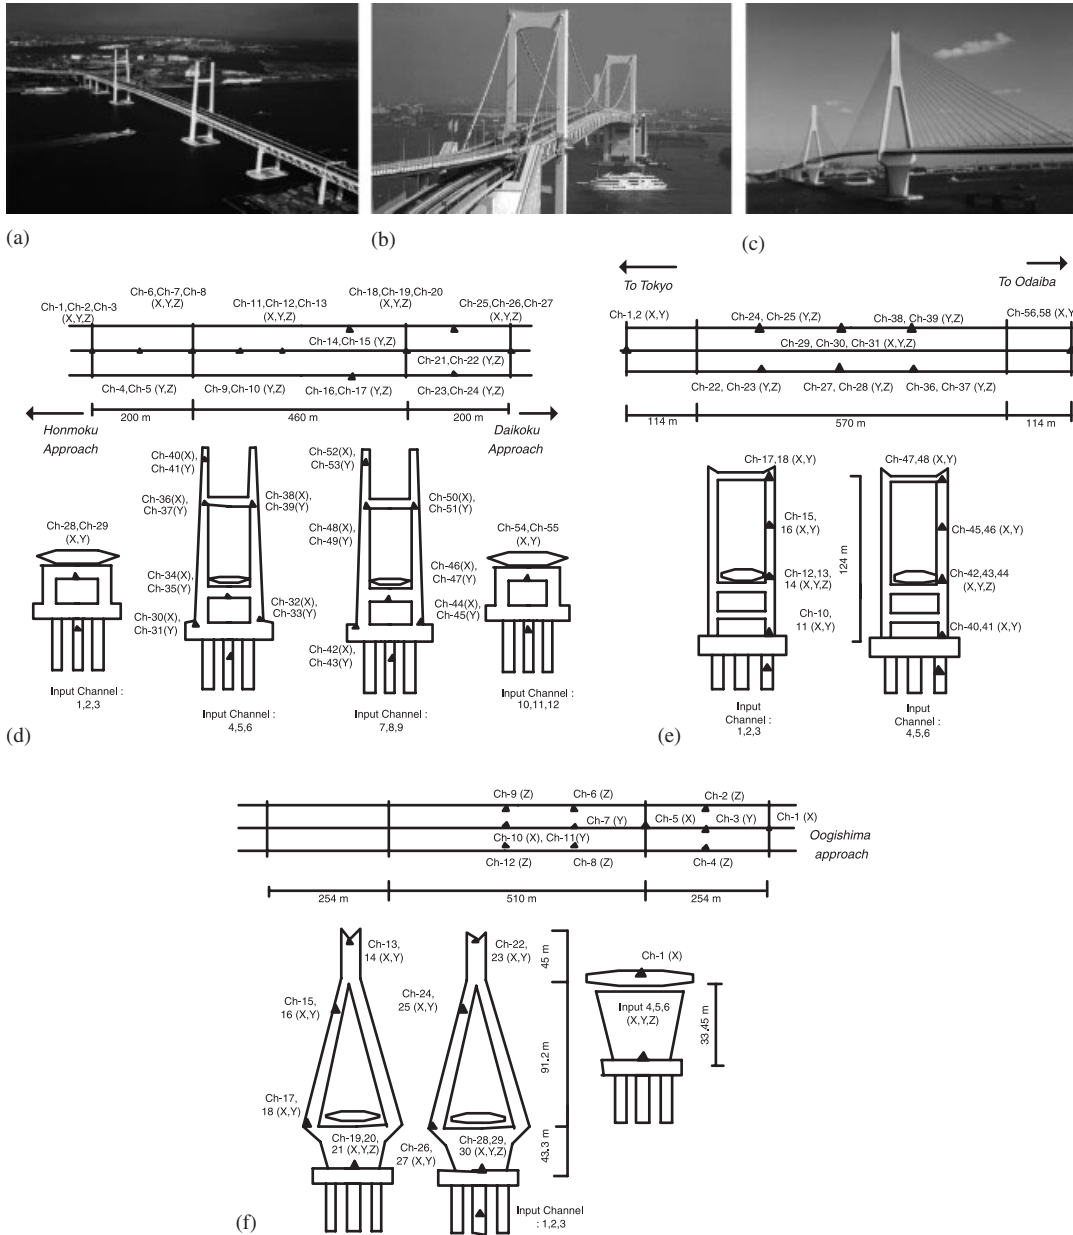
View of the studied bridges: (a) Yokohama Bay Bridge; (b) Rainbow Bridge; and (c) Tsurumi Fairway Bridge. Sensor arrangement for SI of (d) Yokohama Bay Bridge; (e) Rainbow Bridge; and (f) Tsurumi Fairway Bridge.
